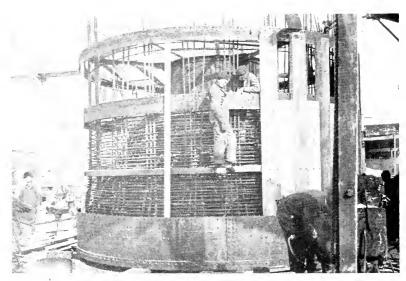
Pier 4. Cutting Edges, showing Heavy Reinforcement and Staves.
